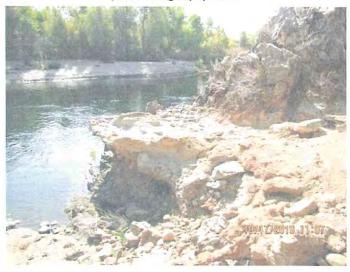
& 2 - Concrete foundations that once supported structures and processing equipment at the Big Blue Mill
